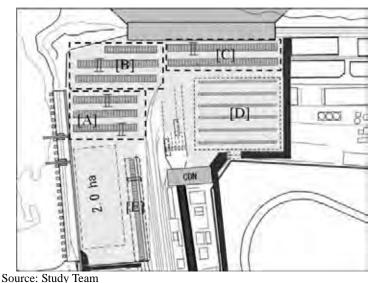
Layout plan of the container yard on the South Wharf
